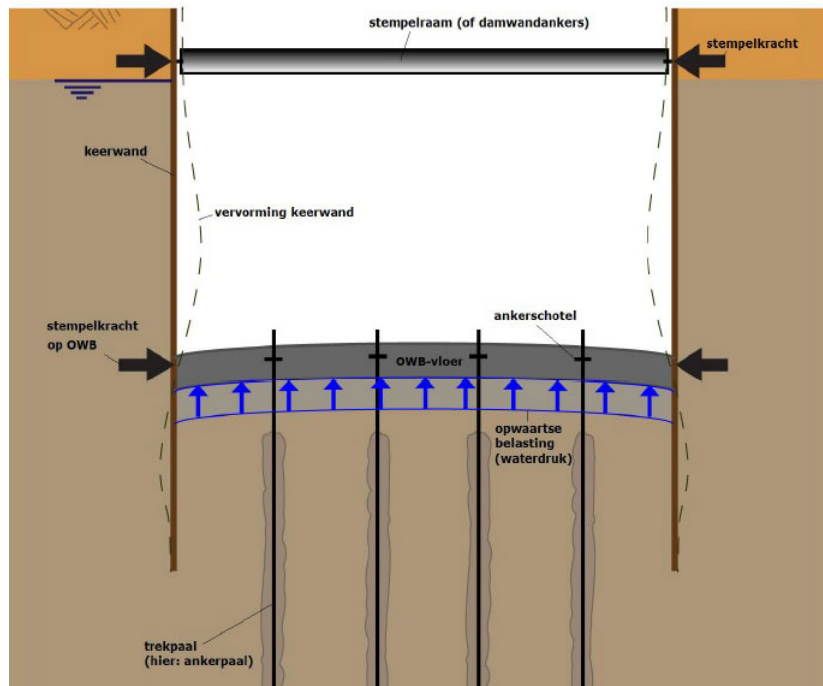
Passive soil pressure will cause the sheet piles to deform which will introduce an (eccentric) strut force on the UWC floor. Adapted from Arkesteijn, 2012
